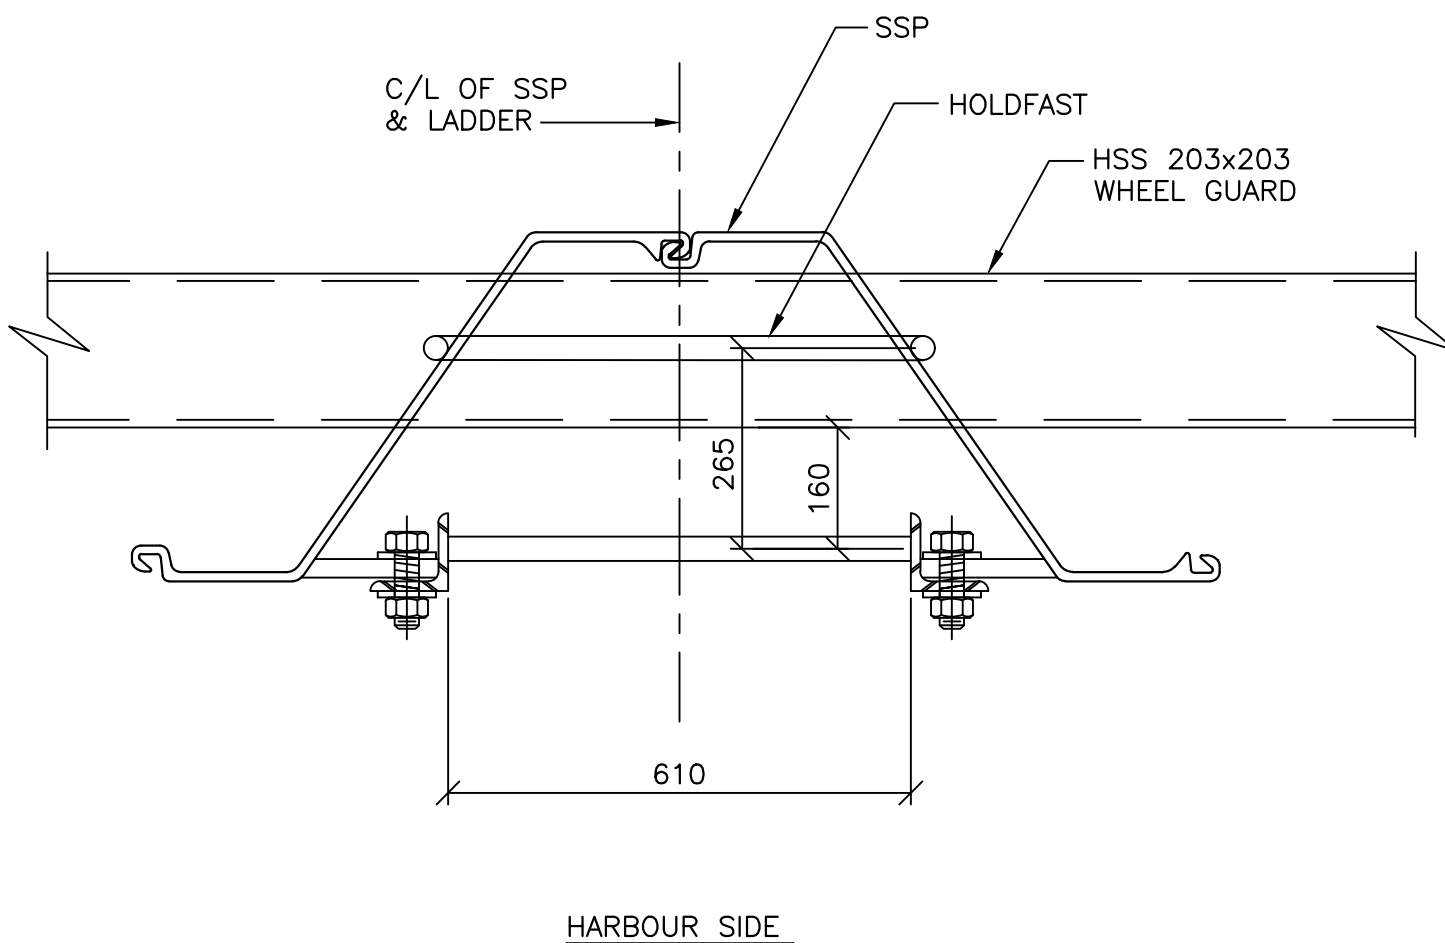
DETAIL-STEEL LADDER @ SSP BULKHEAD 1
